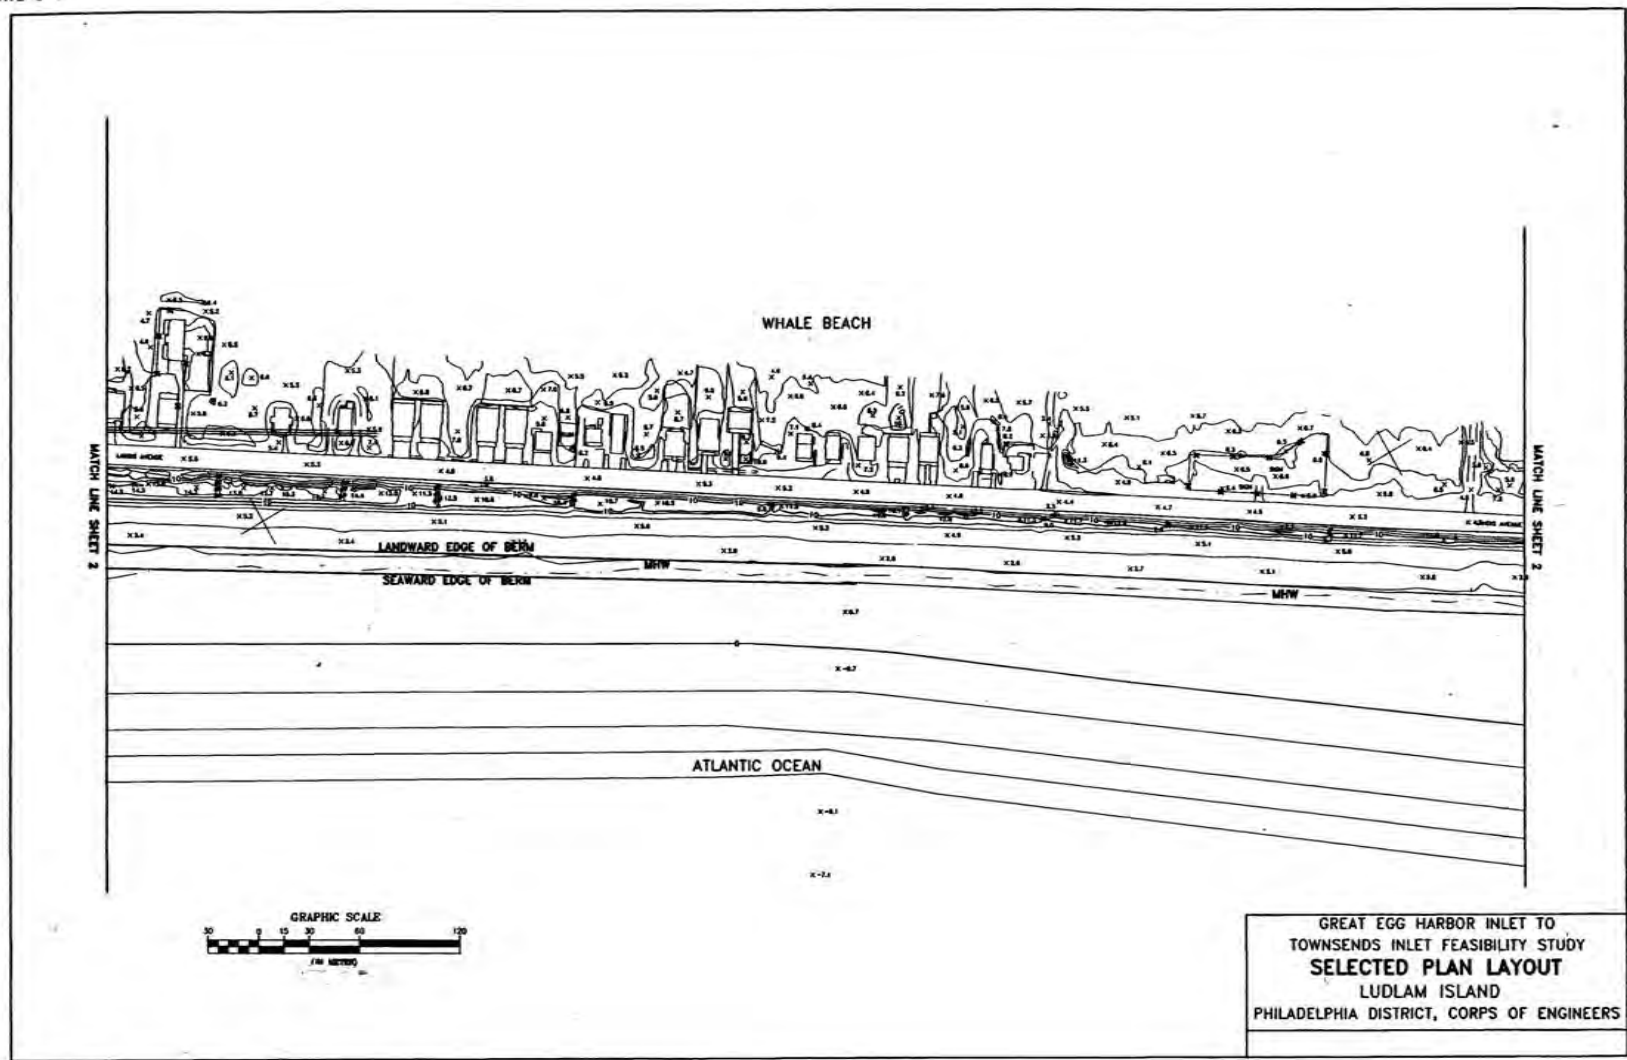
Selected Plan Layout for Ludlam Island, NJ -3rd Street to 14th Street, Sea Isle City
